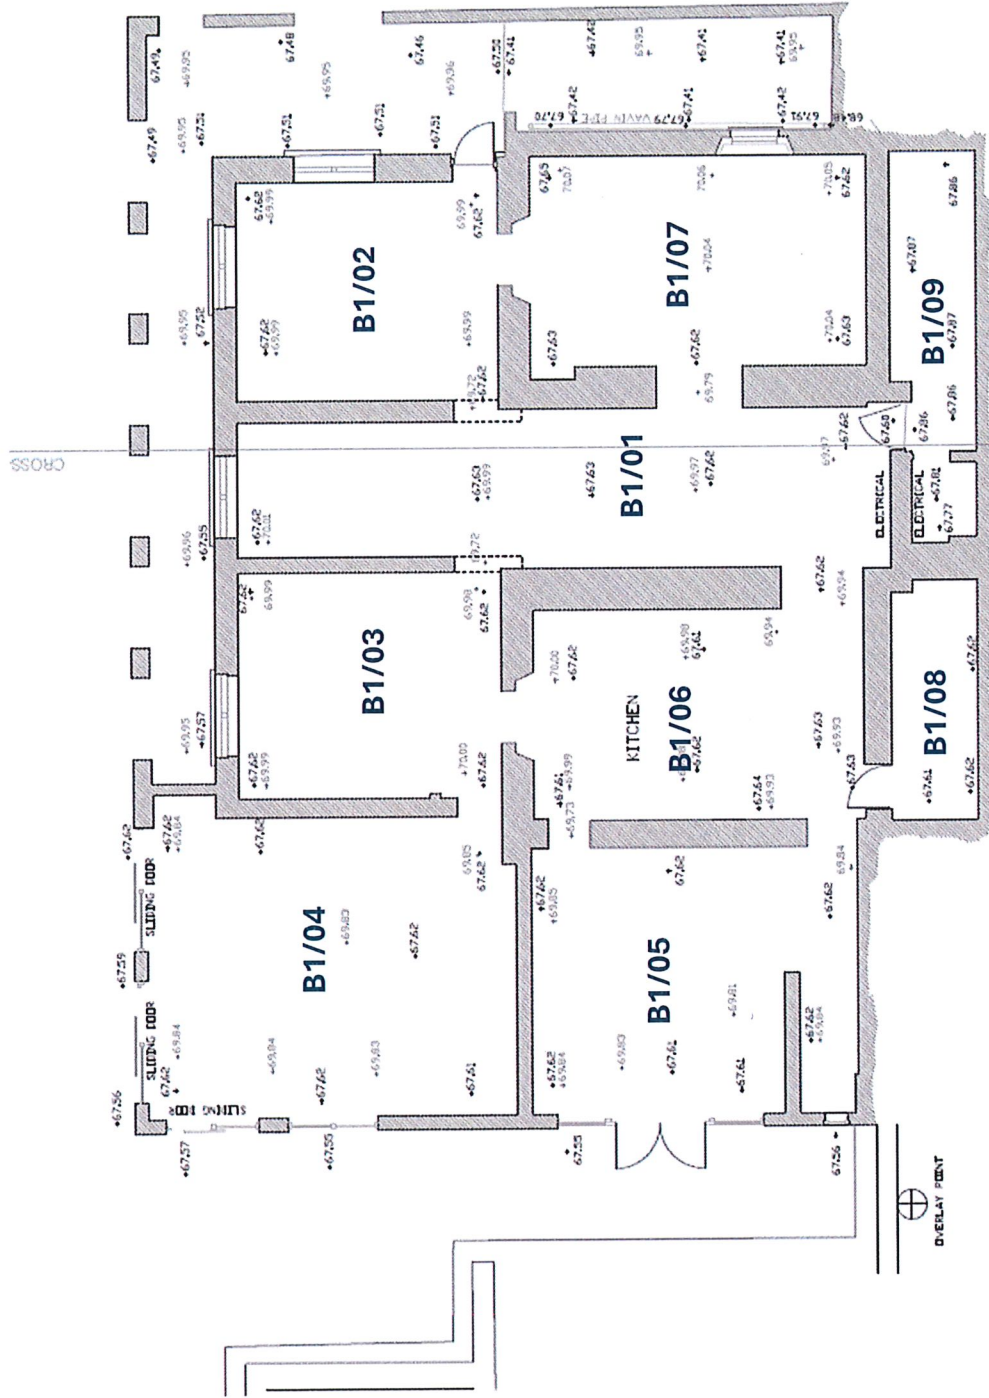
Cedar Mount House – Existing Lower Ground Floor plan.
